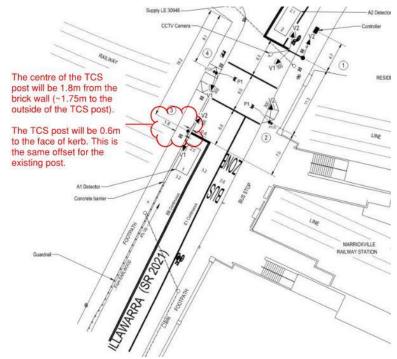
TCS plan - Signal post adjustment at Illawarra Road
